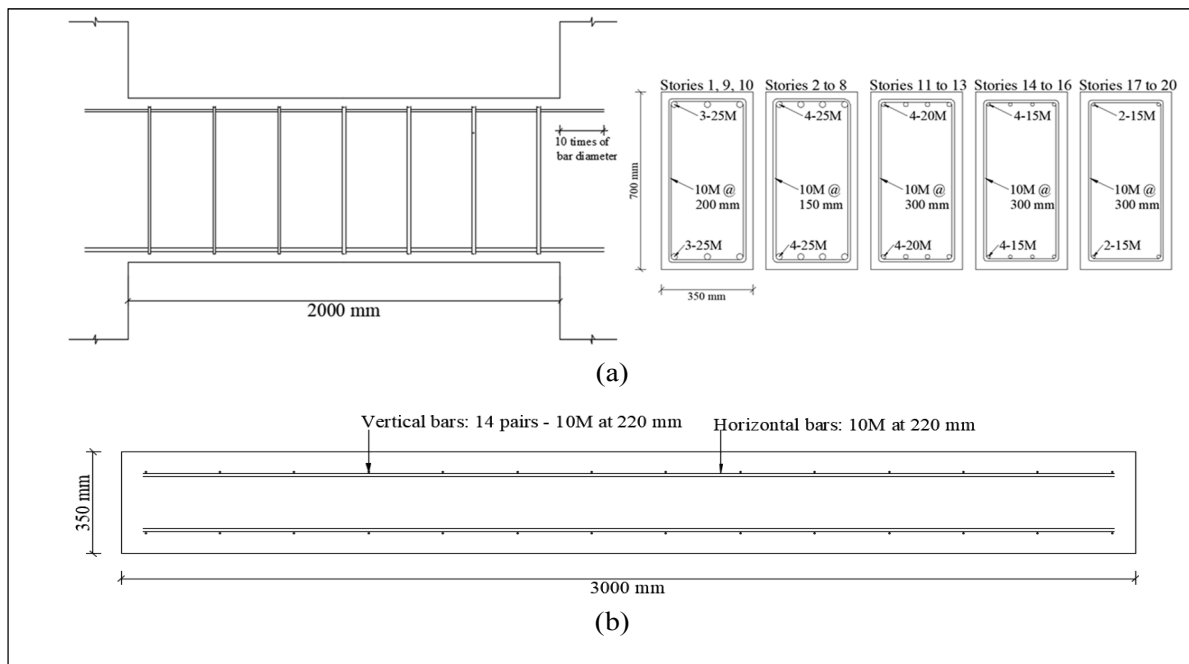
Design summary of CSW1941: (a) Reinforcement details of conventionally reinforced CBs, (b) Reinforcement details of a wall
